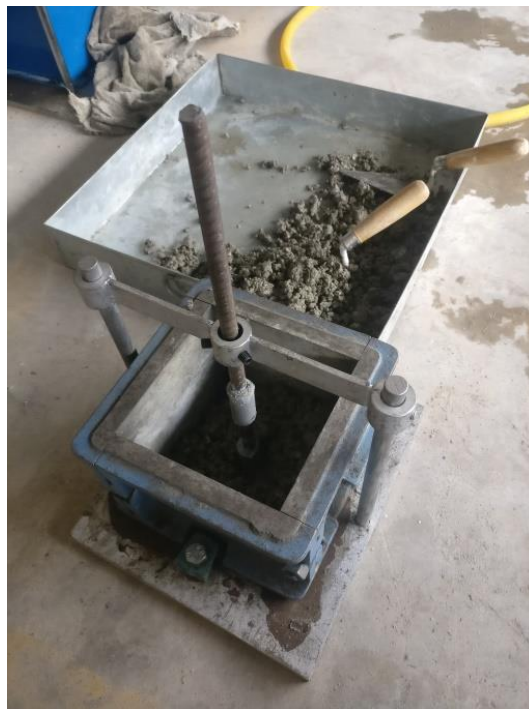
In-situ casting for 150 mm dimensional pull-out specimen
